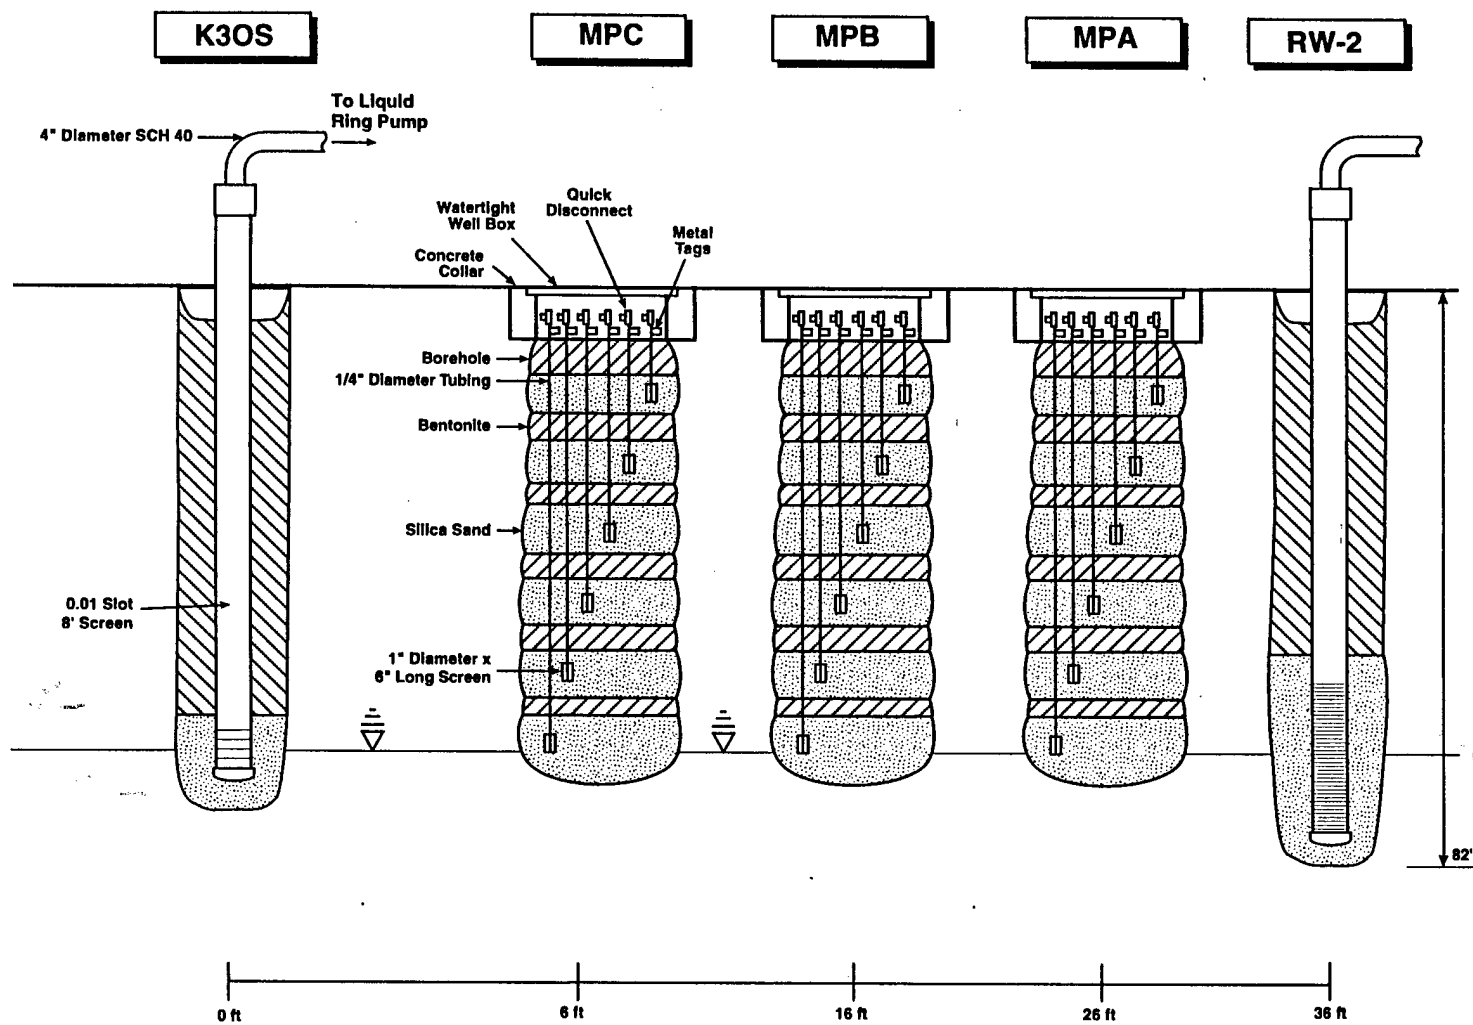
Construction Details of Monitoring Well RW-2 and K30S, and Soil Gas Monitoring Points at K.I. Sawyer AFB, MI
